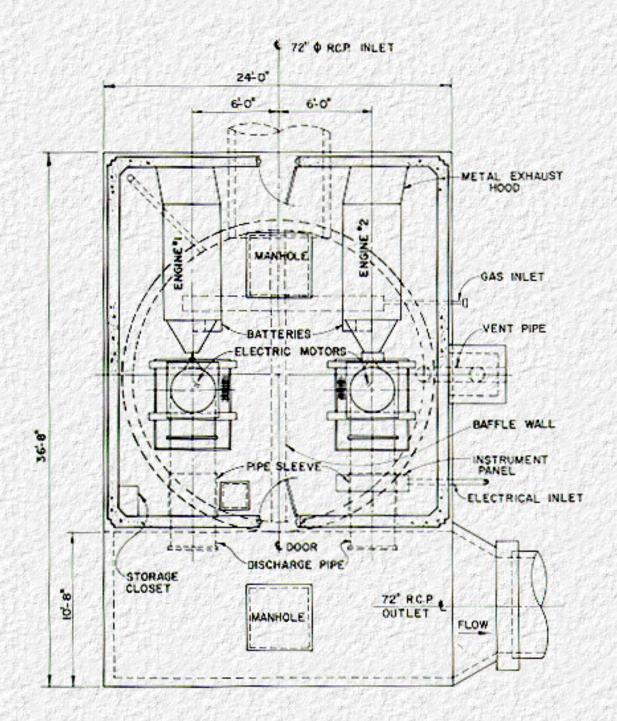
Floor Plan of Wet-Pit Type Pump Station
